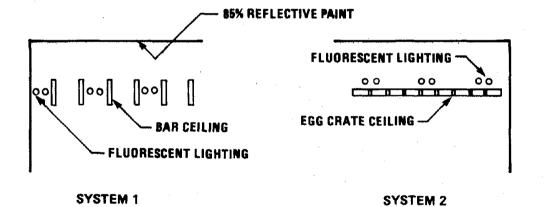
STATION ILLUMINATION TYPICAL OPEN CEILING
